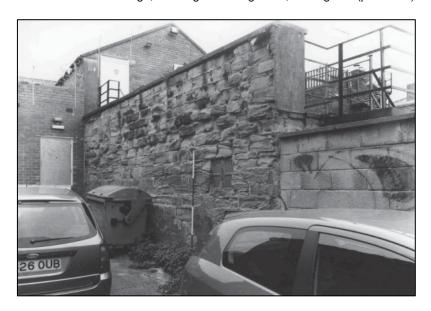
Stone wall to N end of yard wall to E of range, looking NE (photo 2/7).
